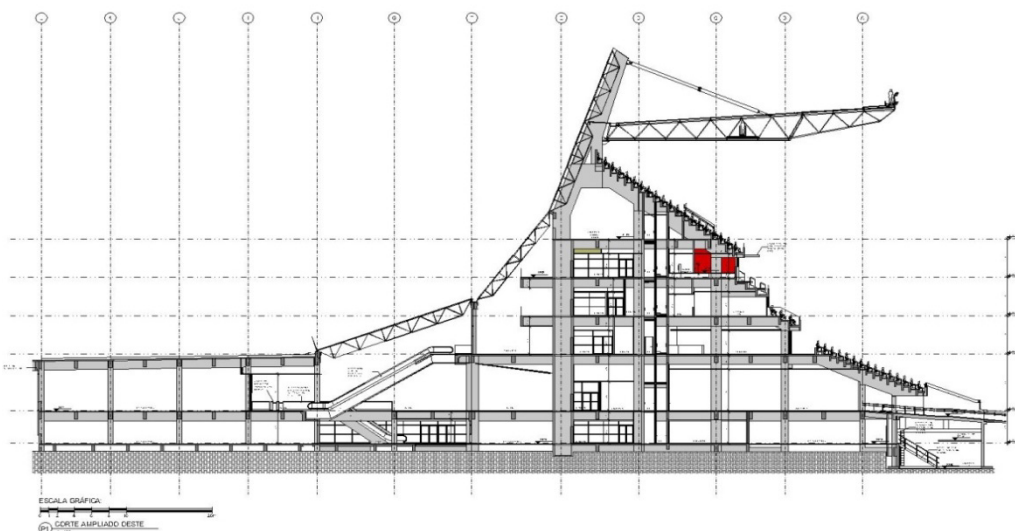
Vertical section showing six floor levels and cable-stayed metal structure overhang.
